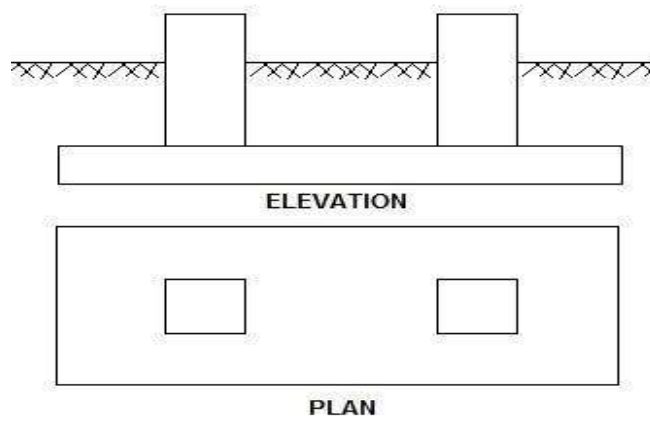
Combined Footing (Types of shallow foundations, n.d.)
